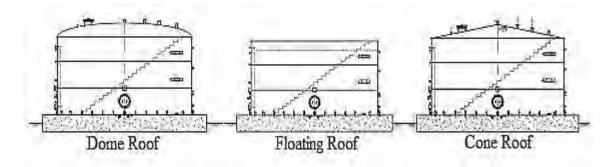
Dome, floating and cone roof type of storage tank. (Source: www.parstechnic.com)
